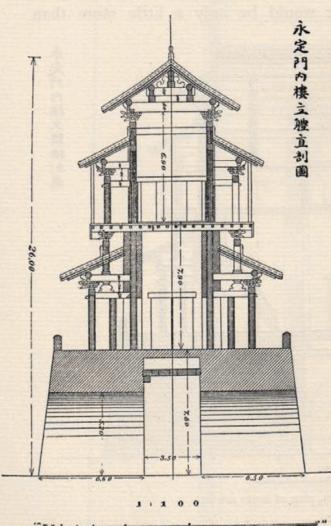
Yung Ting Men, cross section of the inner tower.
